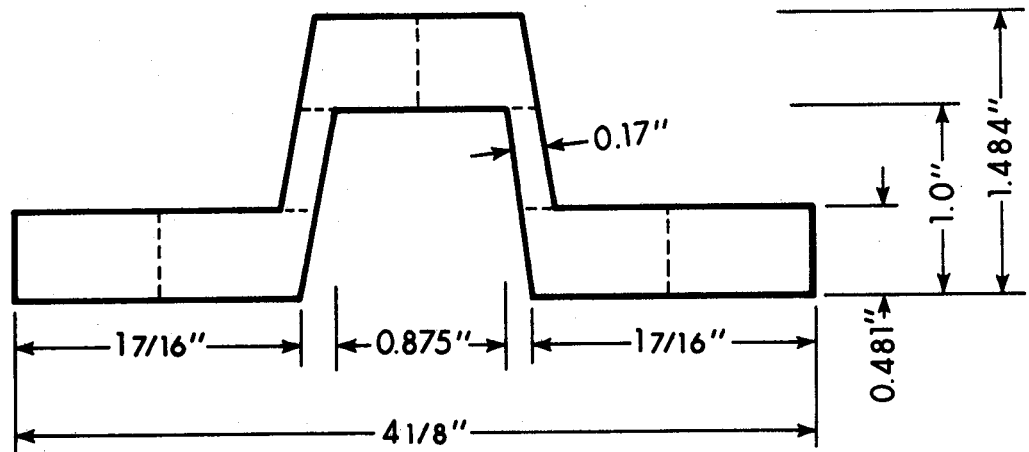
SECTION L - DIMENSIONS TAKEN FROM MANUFACTURERS CATALOGUE
